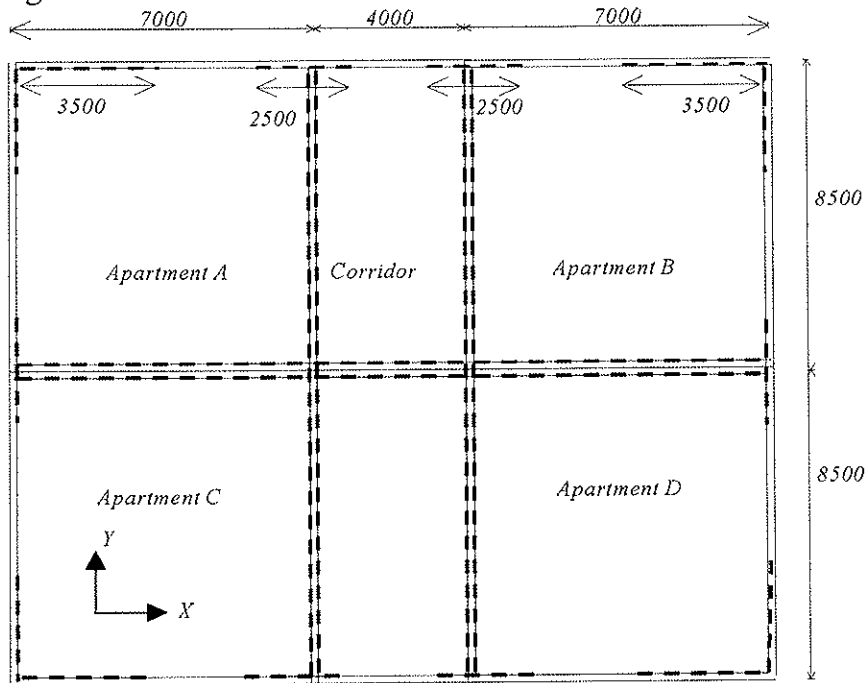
A schematic diagram of the shear walls in the first storey of the building (measures in mm).
